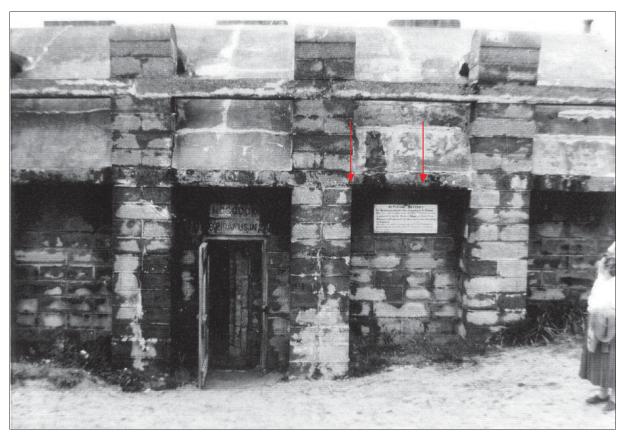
The access door to the 'preserving structure.' Not dated. Red arrows show location of blockwork revealed in Trench 1.
